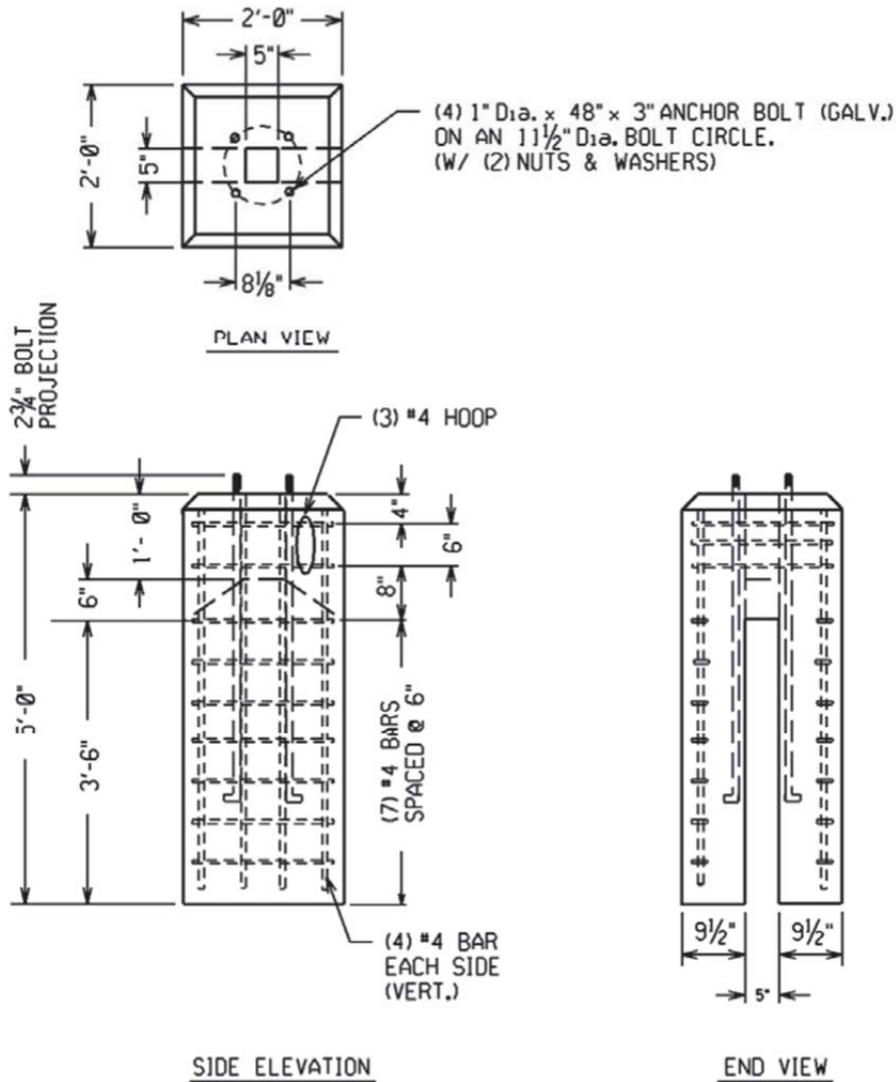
Precast Concrete Street Lighting Foundation - 11½" Bolt Circle
